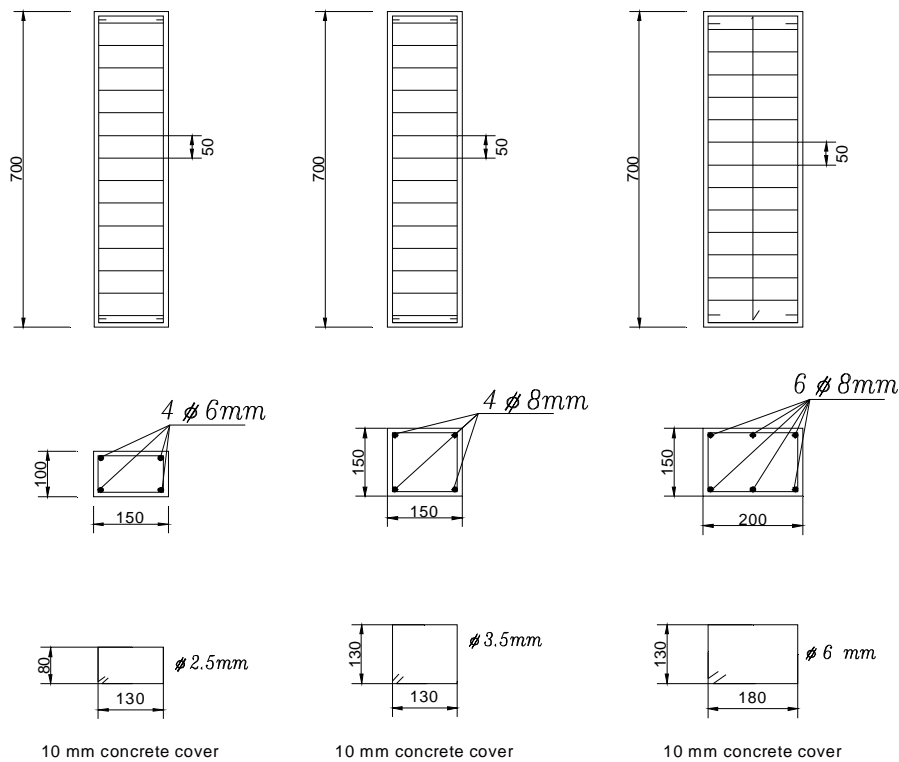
Columns Cross Section and Reinforcement Details of Tested Columns.
